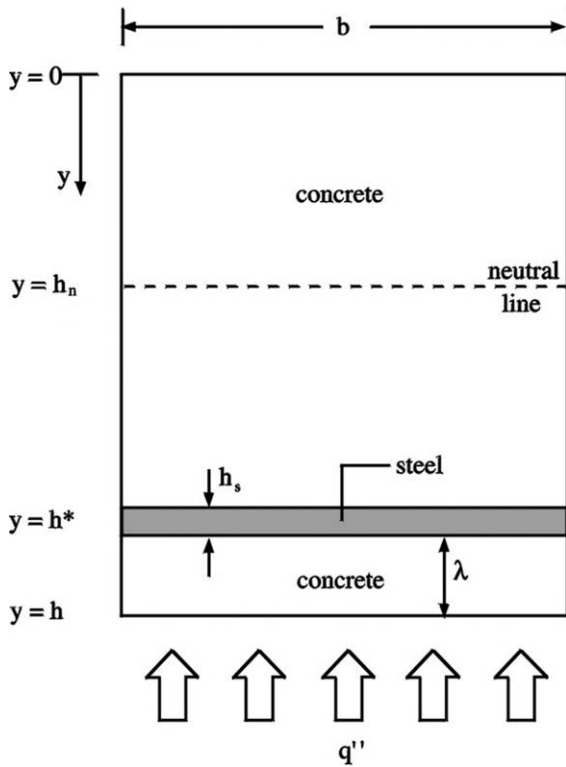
The cross-section of a beam of concrete reinforced with steel and heated suddenly from below.
